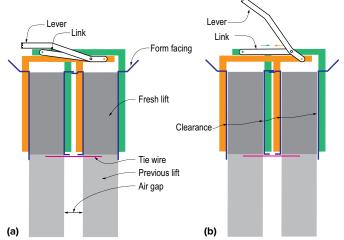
A schematic of the concrete wall-forming machine invented by Willis N. Britton: (a) during concrete placement; and (b) before advancing along the wall
